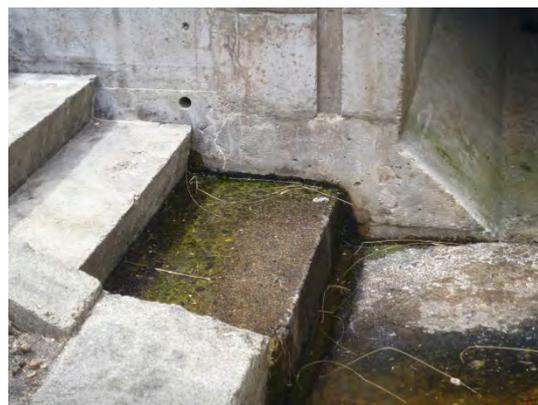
New Leakage at Right Side of Downstream Culvert Area
